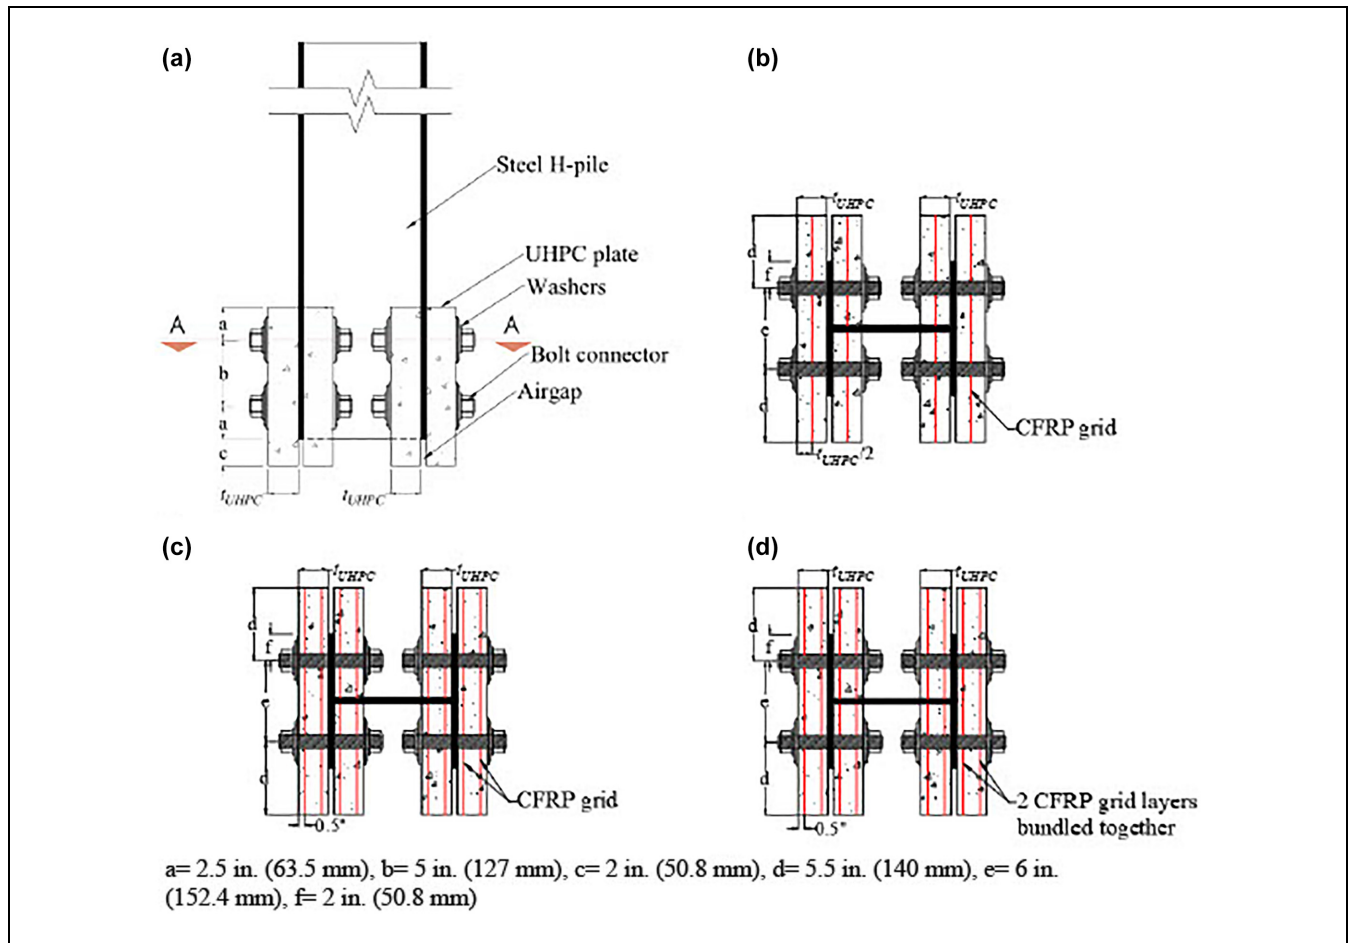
A UHPC repaired test specimen: (a) layout and section A-A indicating specimens reinforced with (b) one, (c) two, and (d) four layers of CFRP grids, respectively.
